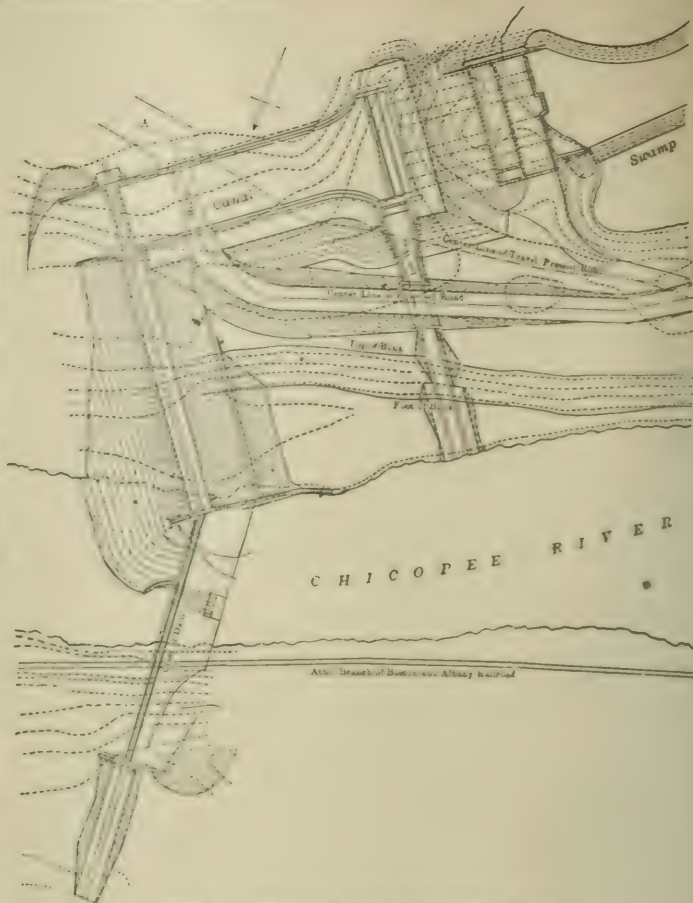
CONTOUR PLAN, RED BRIDGE DAM.
